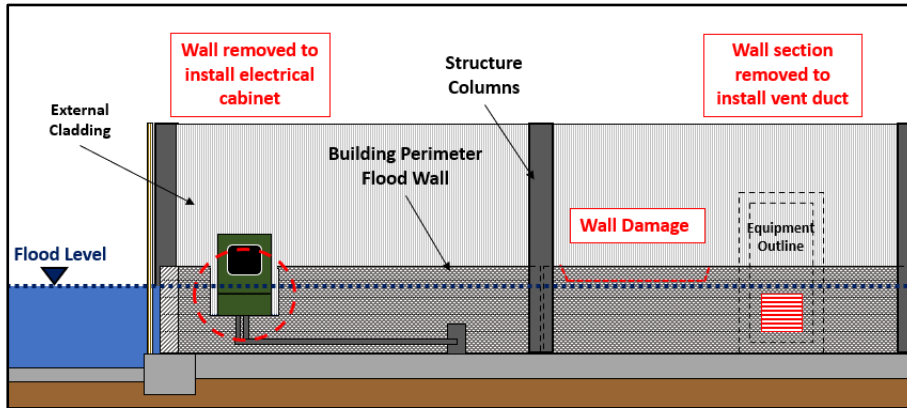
Examples of Facility Actions that Undermine Flood Protection Measures
